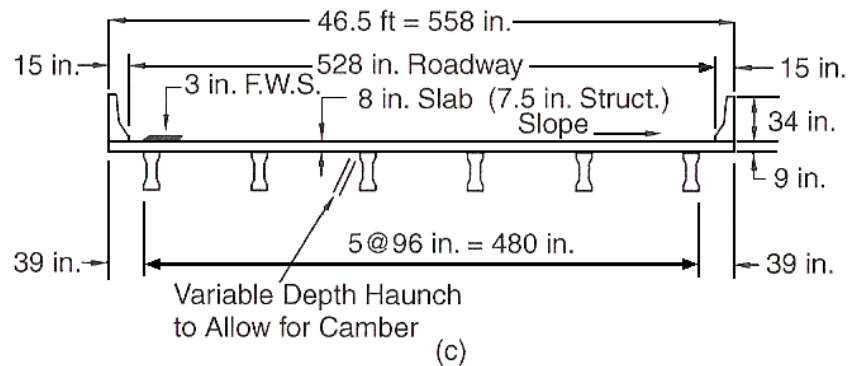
Prestressed concrete girder bridge section for design example #4.
